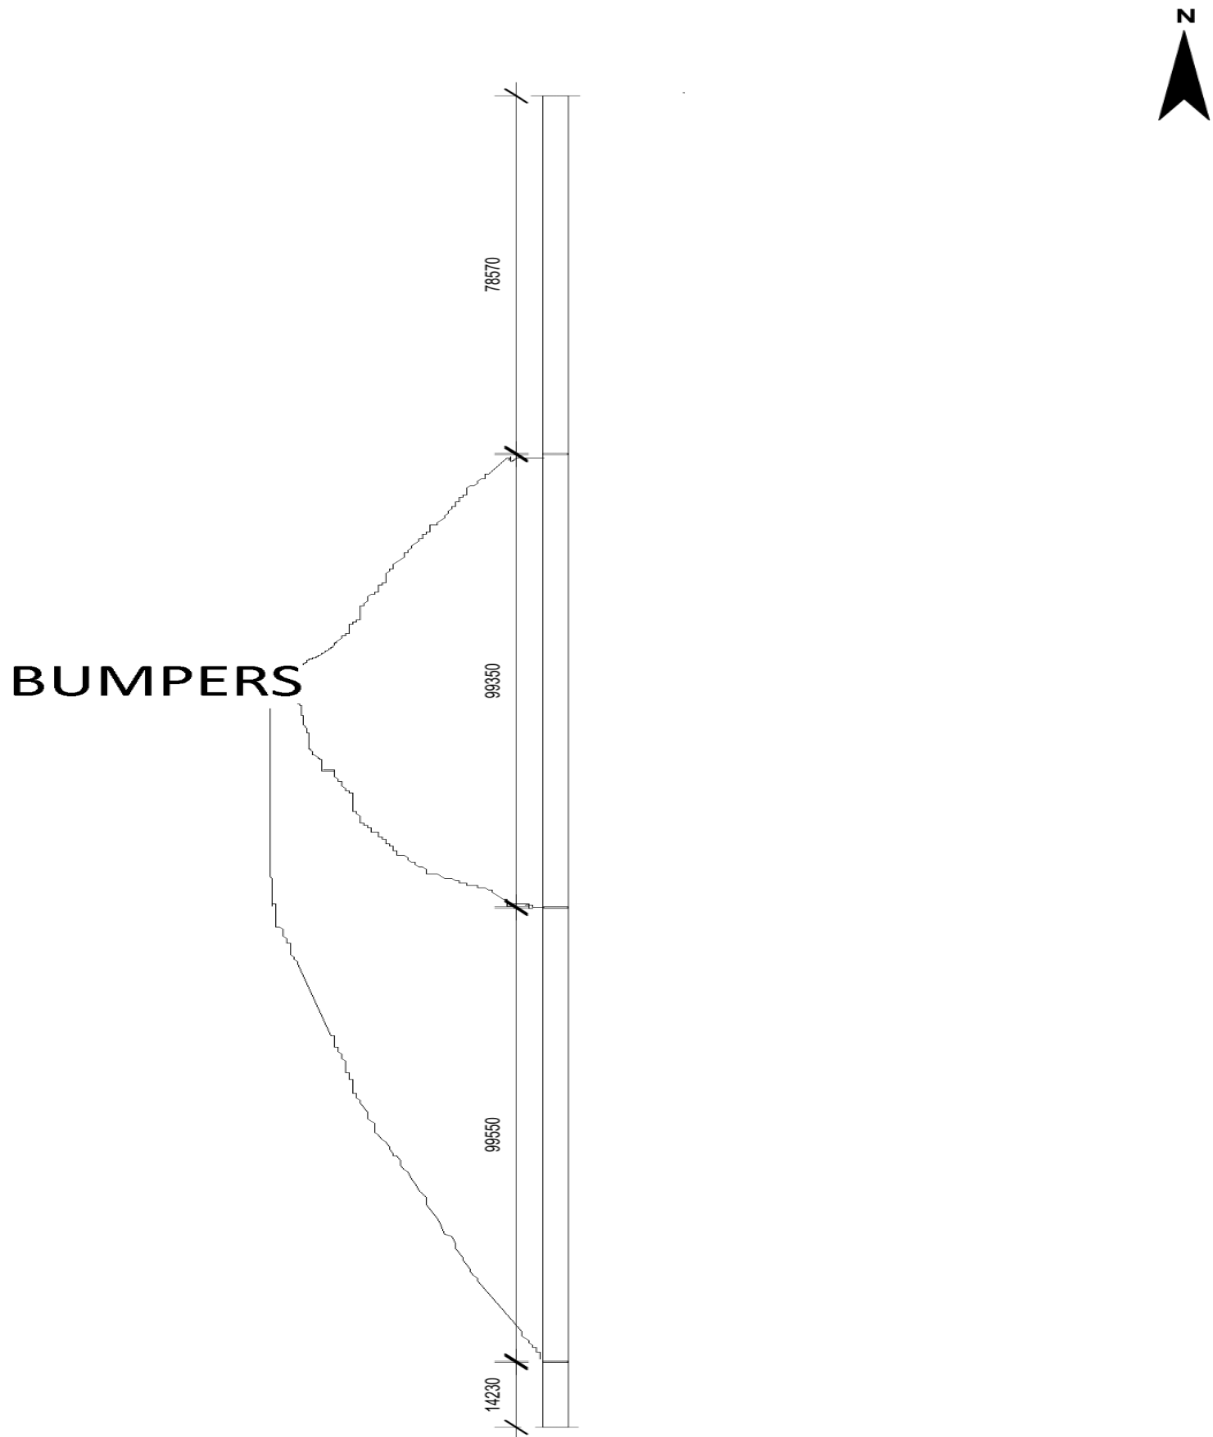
(n): Approximate architectural urban road layout design of the chosen mastic asphalt road (scale=1:1000)
